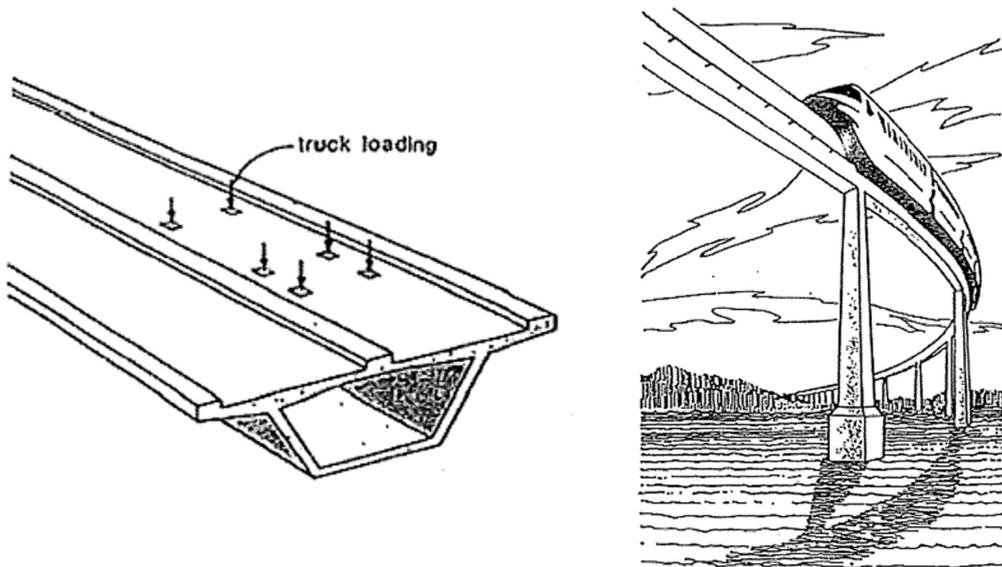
R/C members subjected to torsion, e.g., eccentrically loaded box-girder bridge
